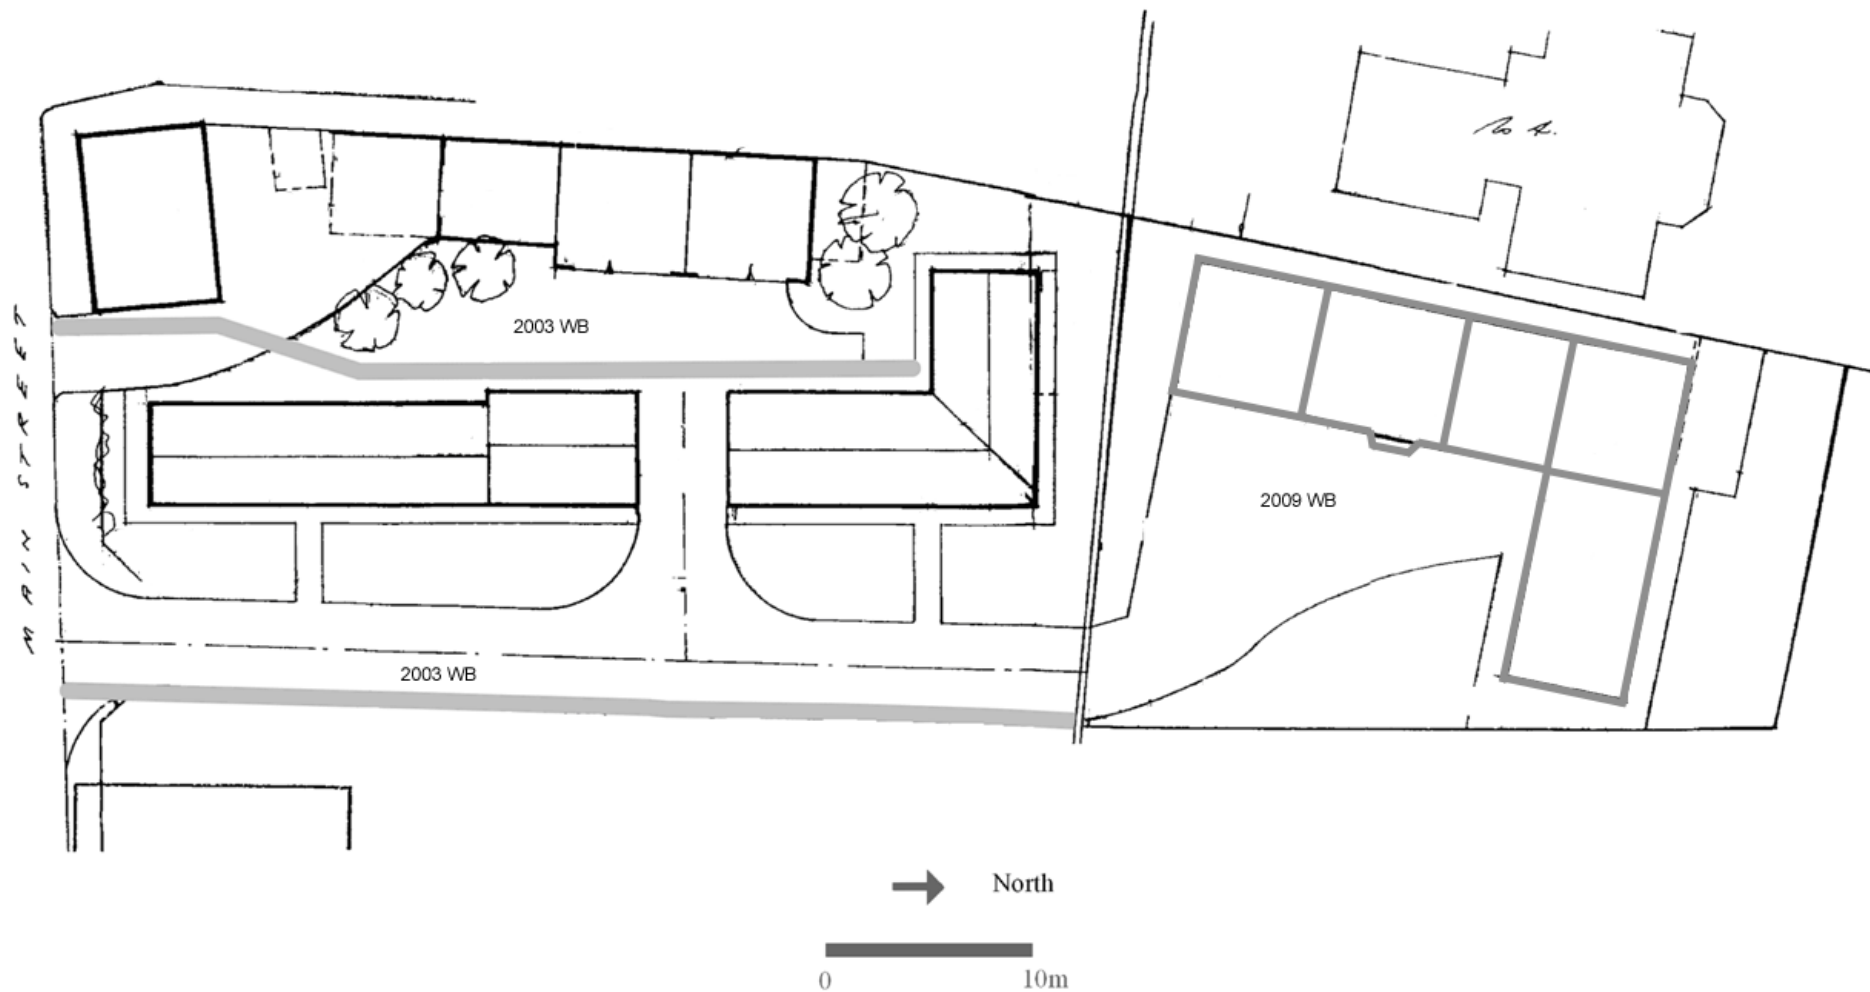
Detailed trench location plan, in relation to the 2003 watching brief
